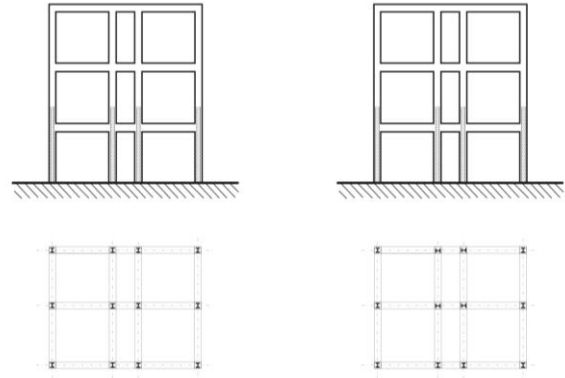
RCC frame with composite columns up to the first floor (Shock Safe Nepal group 1).
